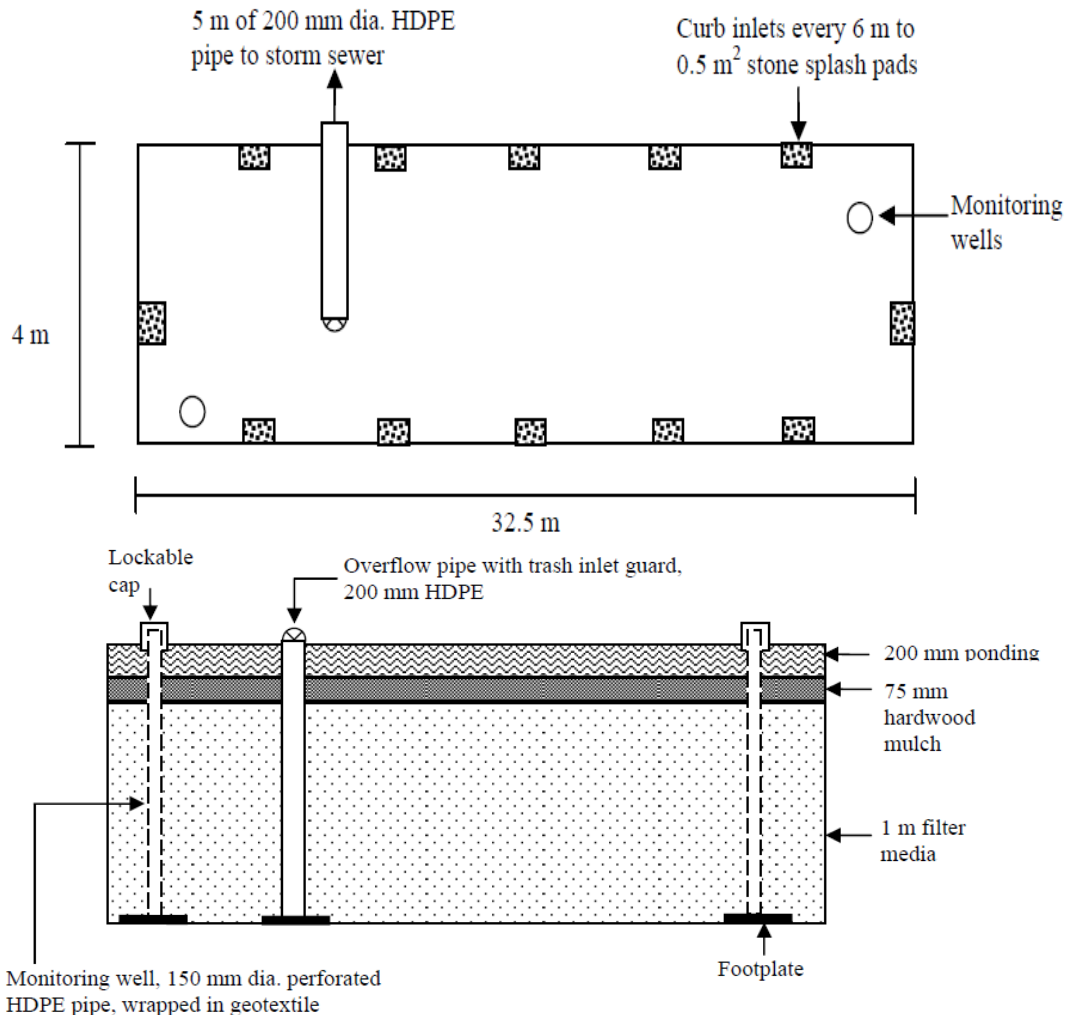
Typical Bio-retention full infiltration design. Plan view (top) and cross section (bottom) (Seters et al., 2013).
